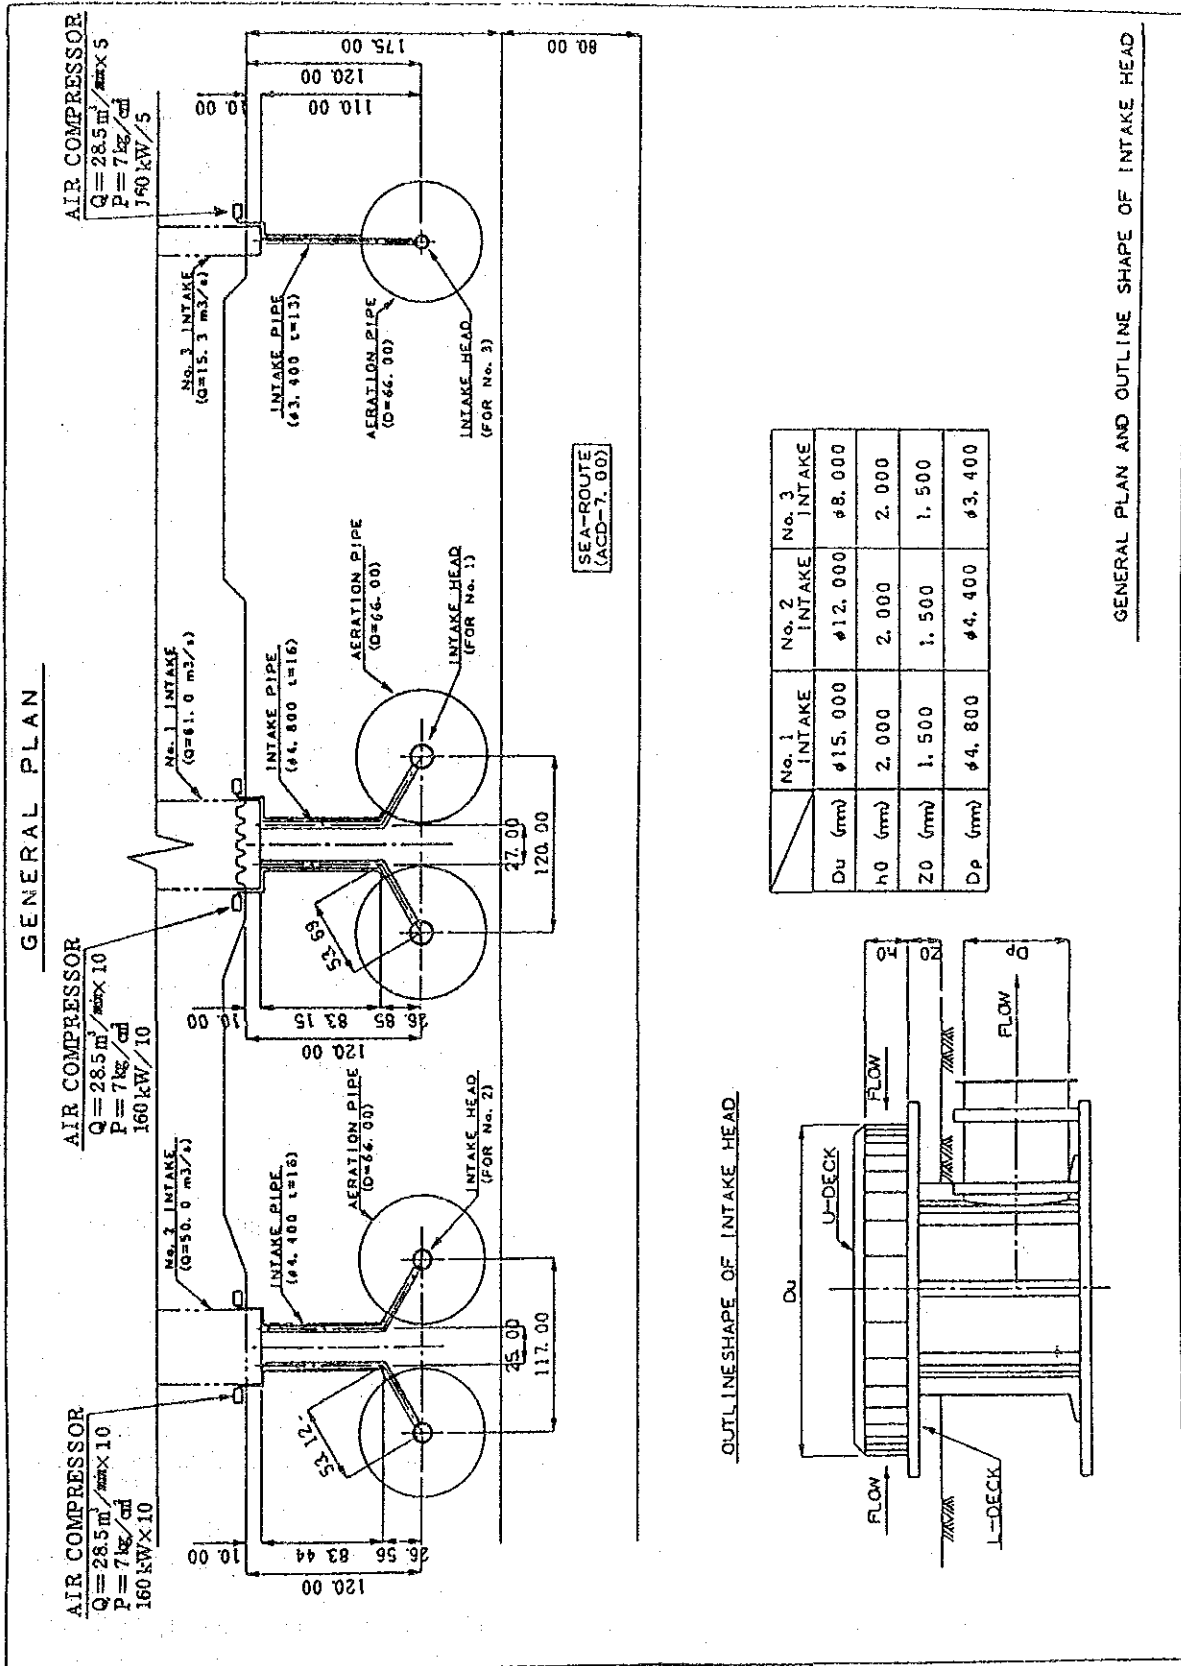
General Plan and Outline Shape of Intake Head
